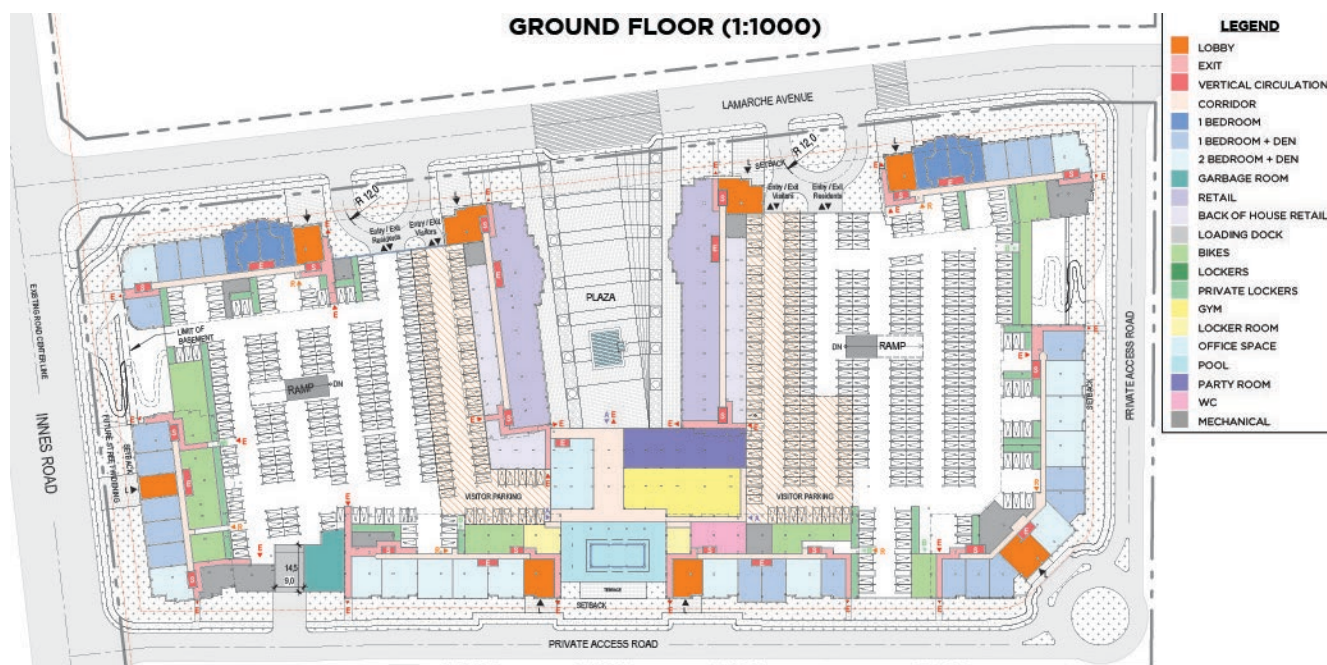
Proposed Ground Floor Parking Plan Showing Town Centre Plaza and Active Frontage Uses
